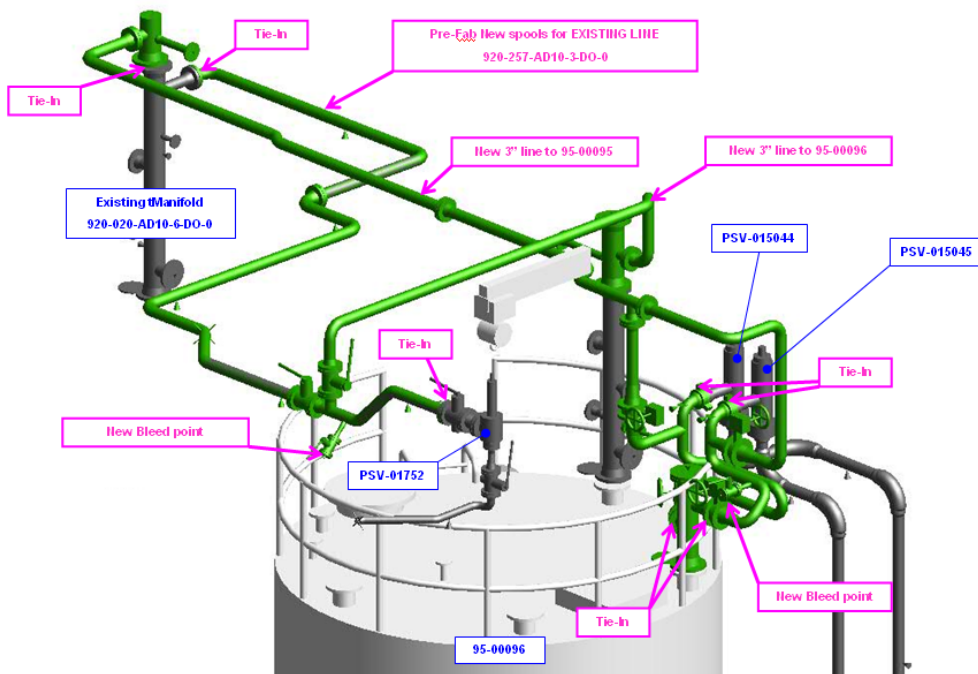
The overview the installation of the Slurry system in Mud Handling system
